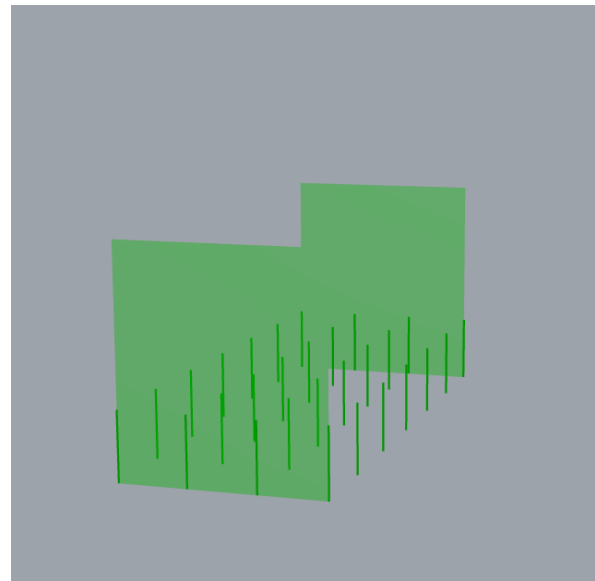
The retrofit geometries applied for retrofitting of the current building, showing the location of shear wall application and column jacketing (author's own work)
